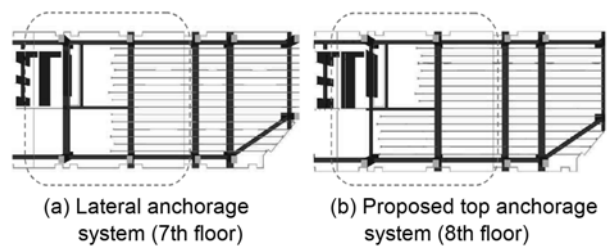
Tendon layout with different anchorage system on slabs (M project)
